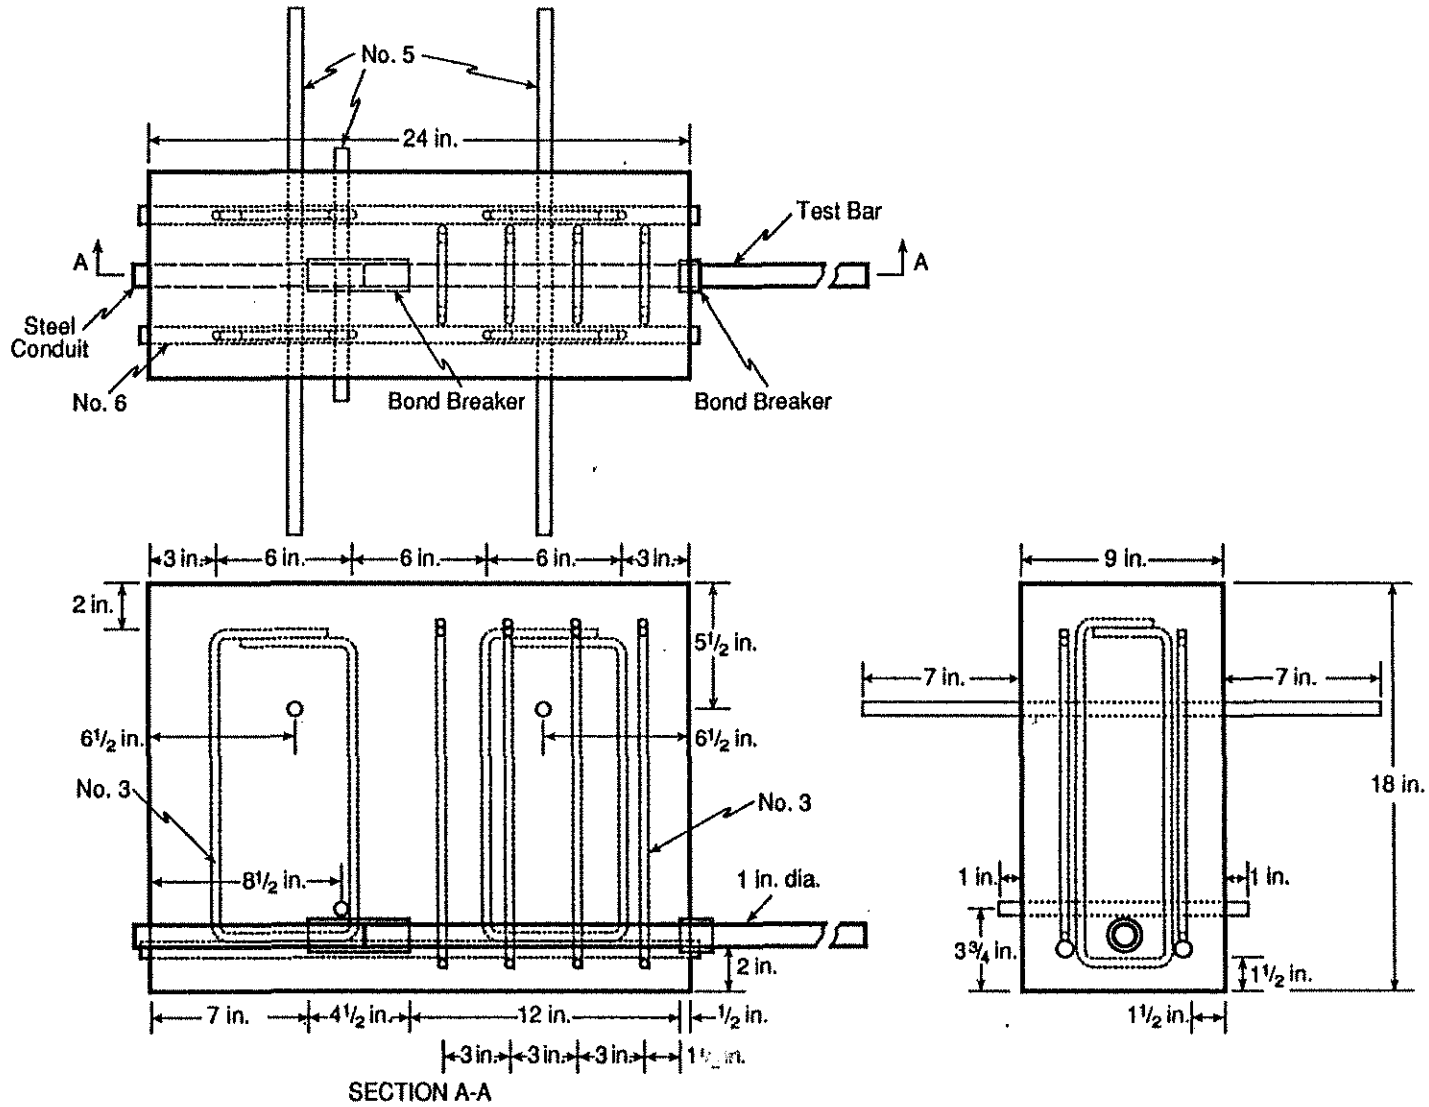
Beam-end test specimen for evaluating the bond strength of reinforcing bars confined by transverse reinforcement
